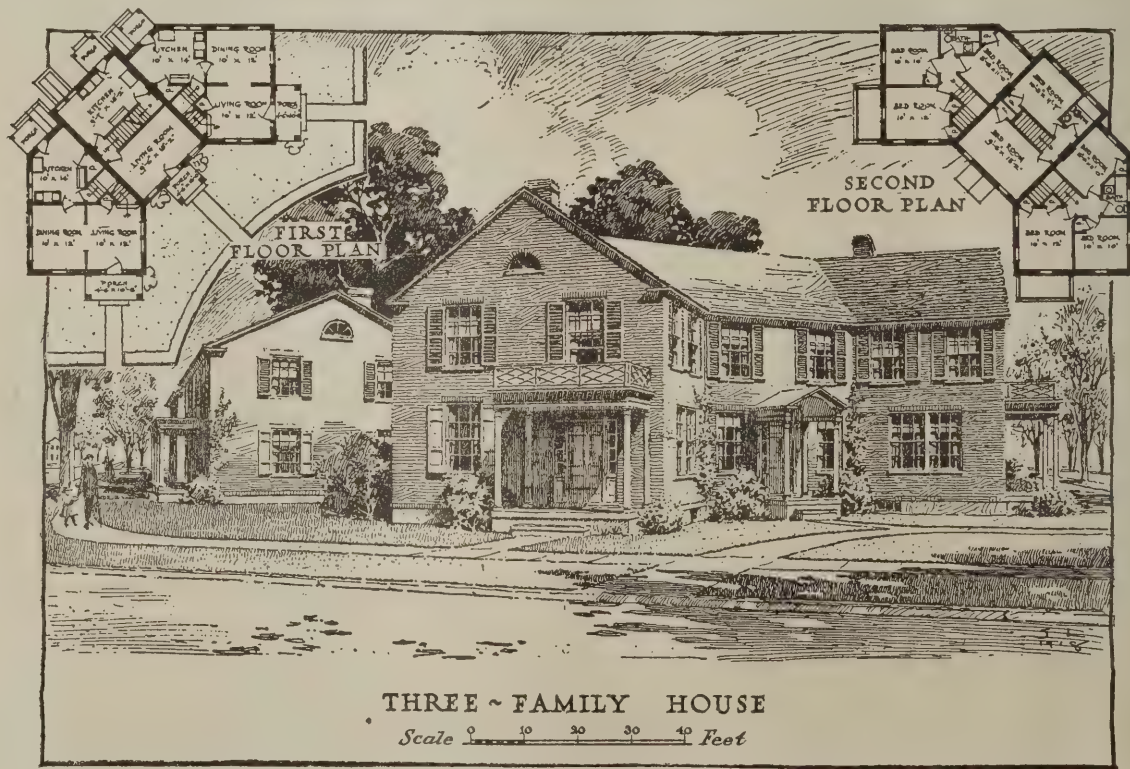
FAIRVIEW VILLAGE—TREATMENT OF CORNER HOUSES, WITH PLAN
